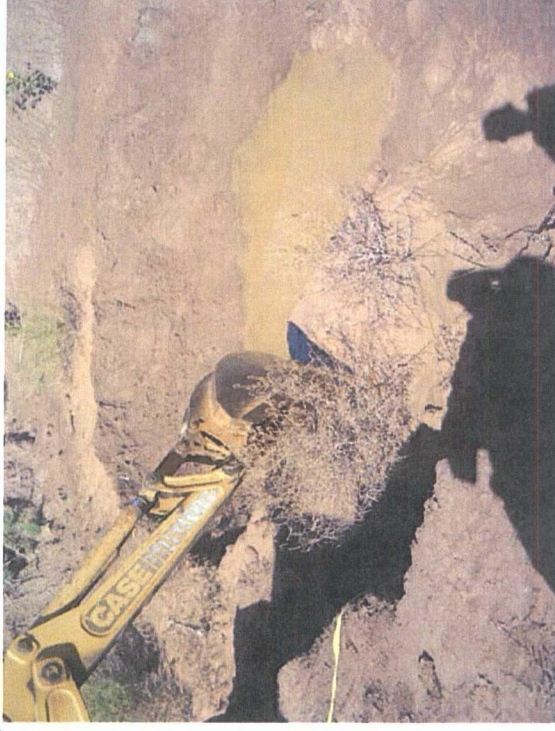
Collecting Confirmation Soil Sample CS-36, looking west
